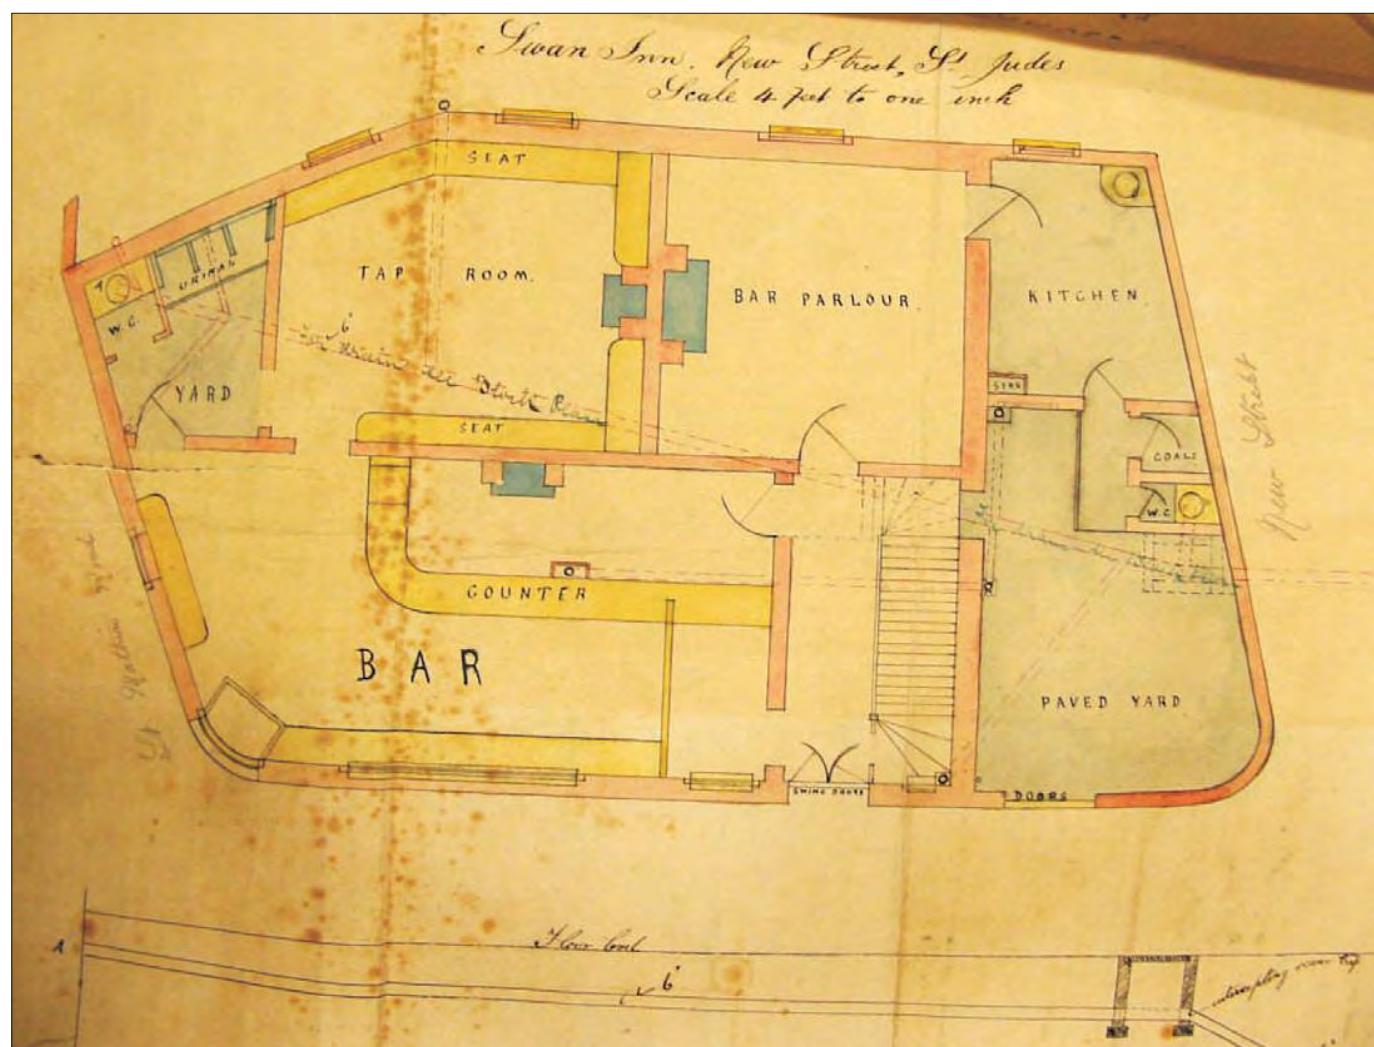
Architect's plan drawing showing ground floor of 'New Swan' pub, July/August, 1891
